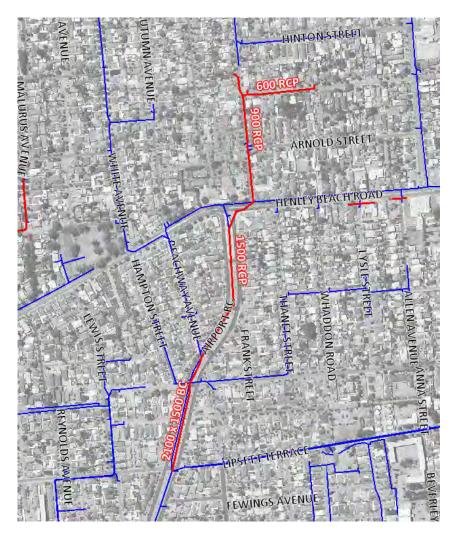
Airport Road, Mellor Avenue Drainage Layout
